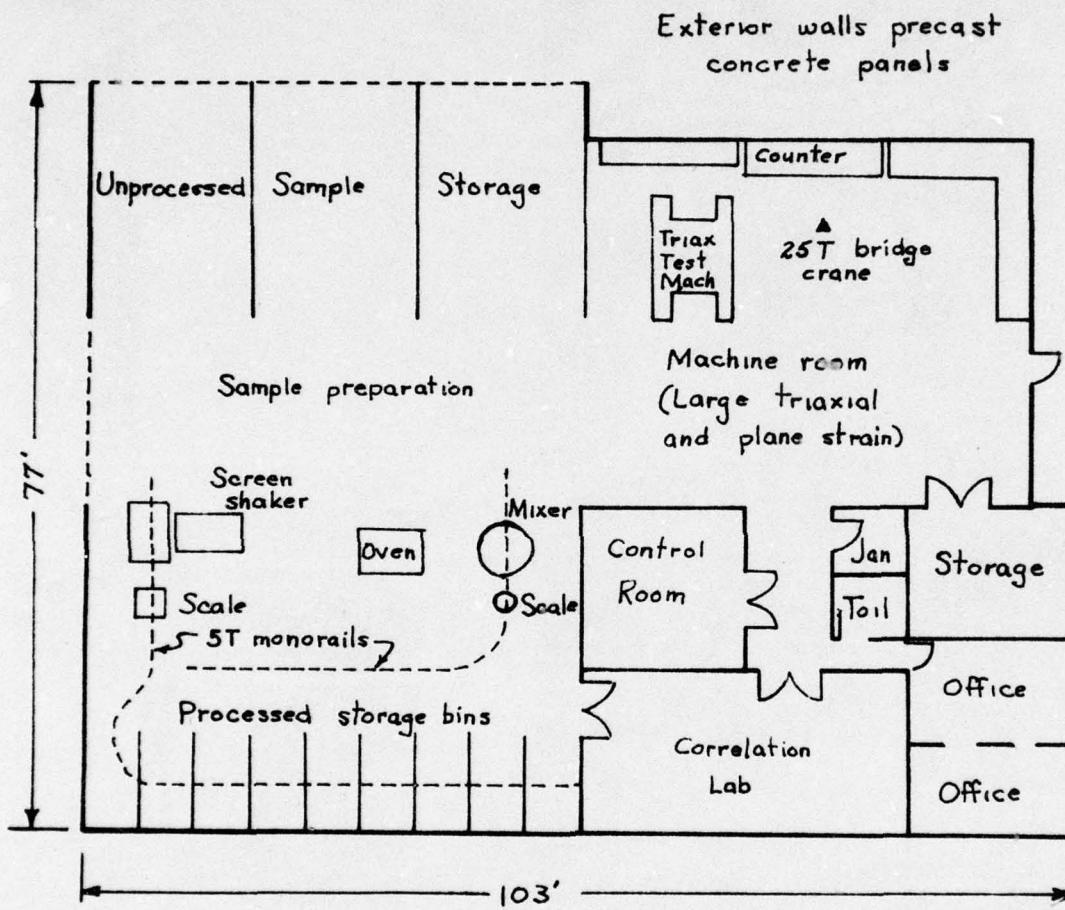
Floor plan of the rockfill testing facility at the University of California
